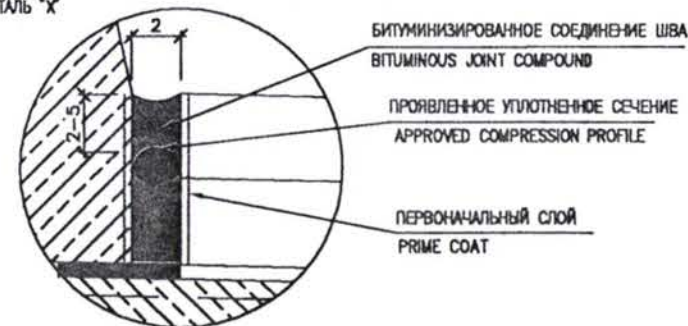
JOINT BETWEEN CARRIAGEWAY AND KERB
